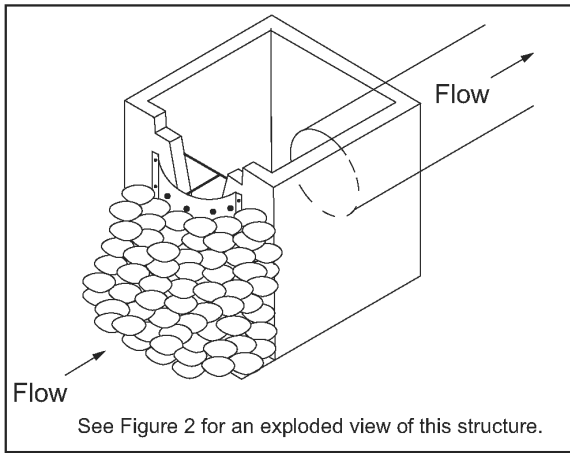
Perforated Half-Round Pipe Retrofit with Stone Filter.
